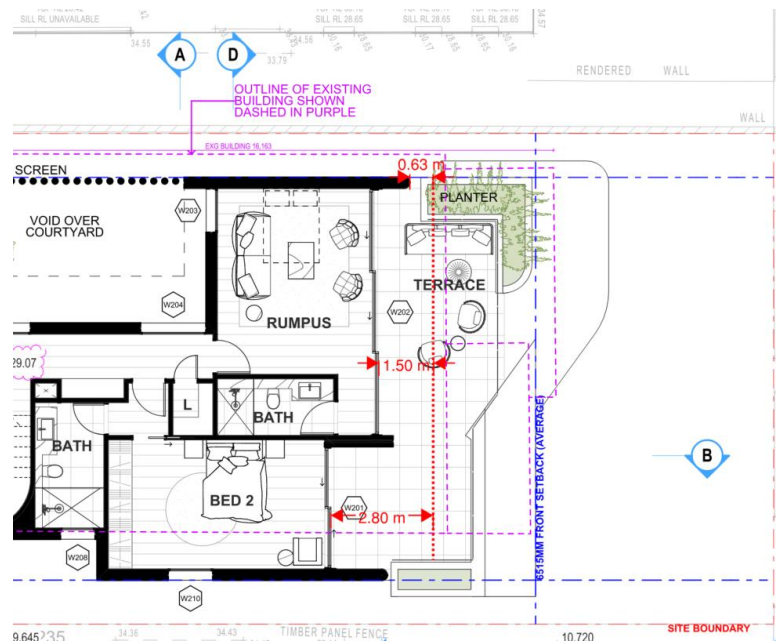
Proposed first floor addition showing in red the conditioned depth of the terrace - 61 The Corso, Maroubra (Source: PopovBass)
